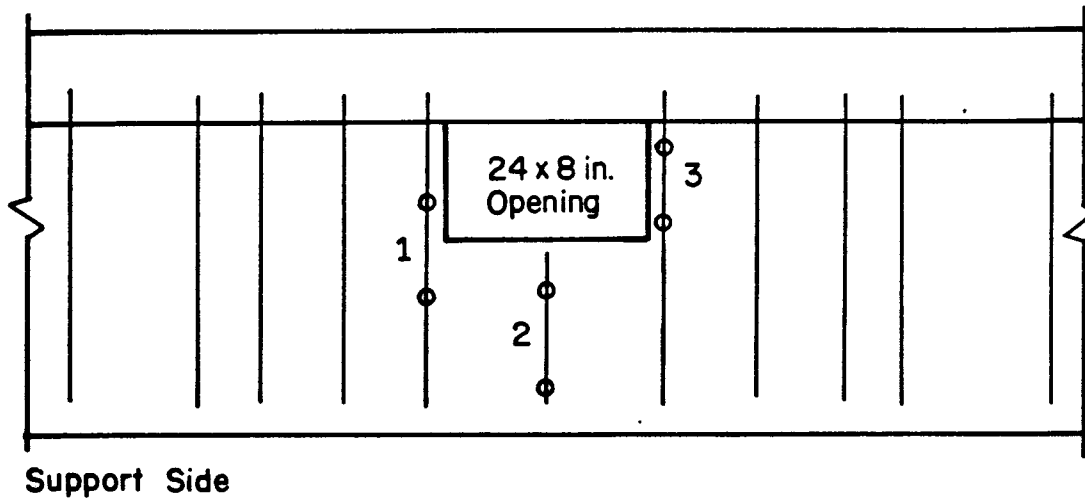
Demec Points on stirrups - BEAM B3 and BEAM D3.
